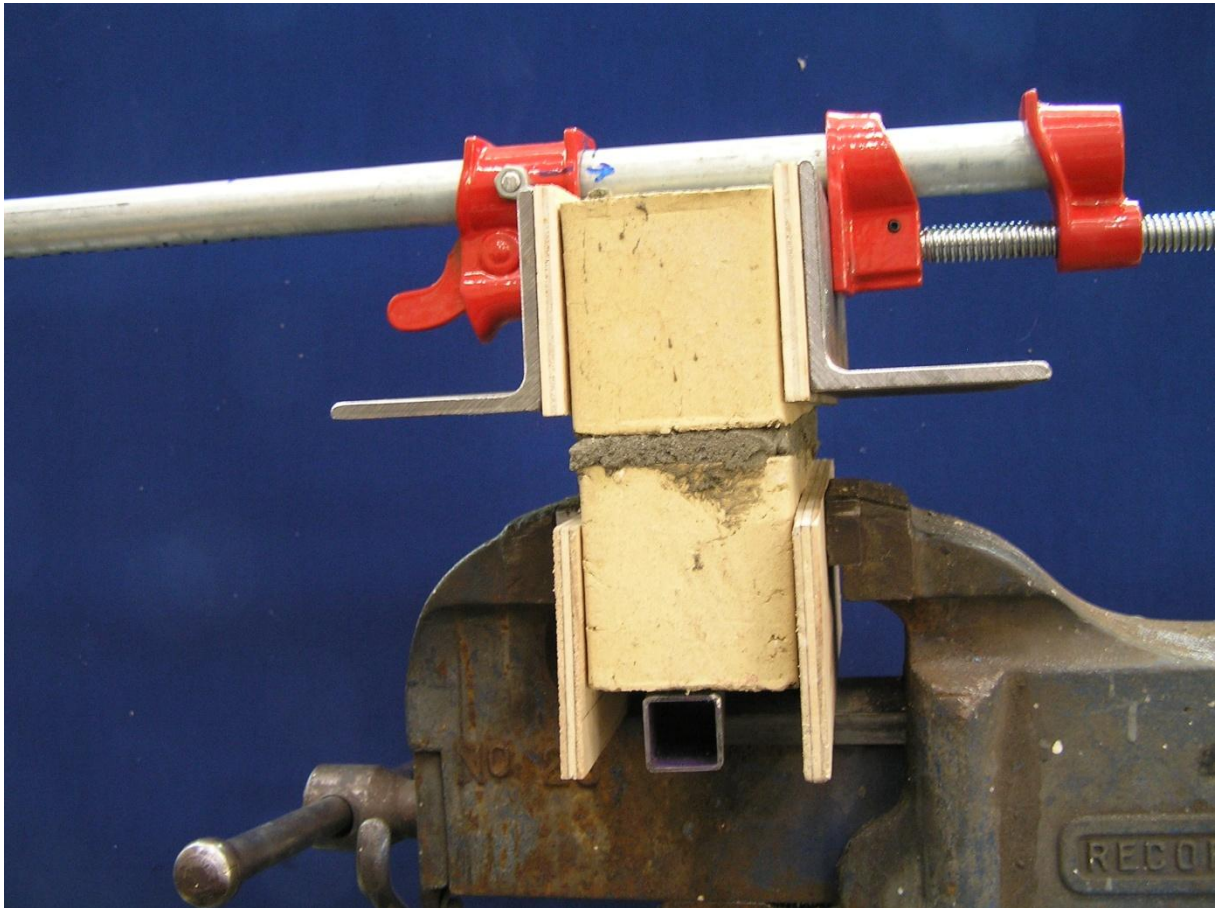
Couplet test – couplet specimen, timber packers, vice and pipe clamp
